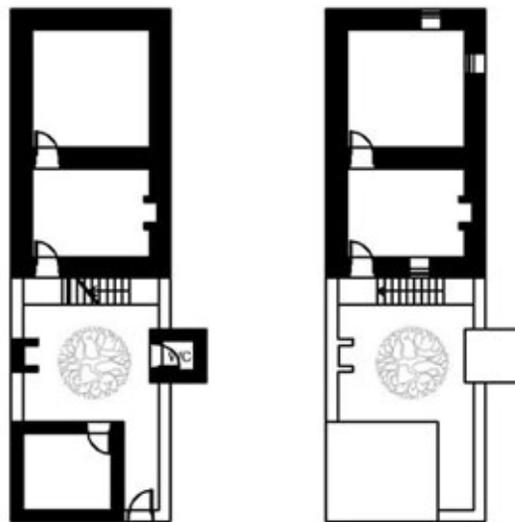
House type 3: ground floor plan (left) and first floor plan (right) (Drawings by author)
